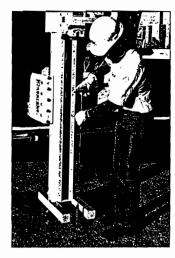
Extension Rods are rotated clockwise to release the MC Piston assembly.
